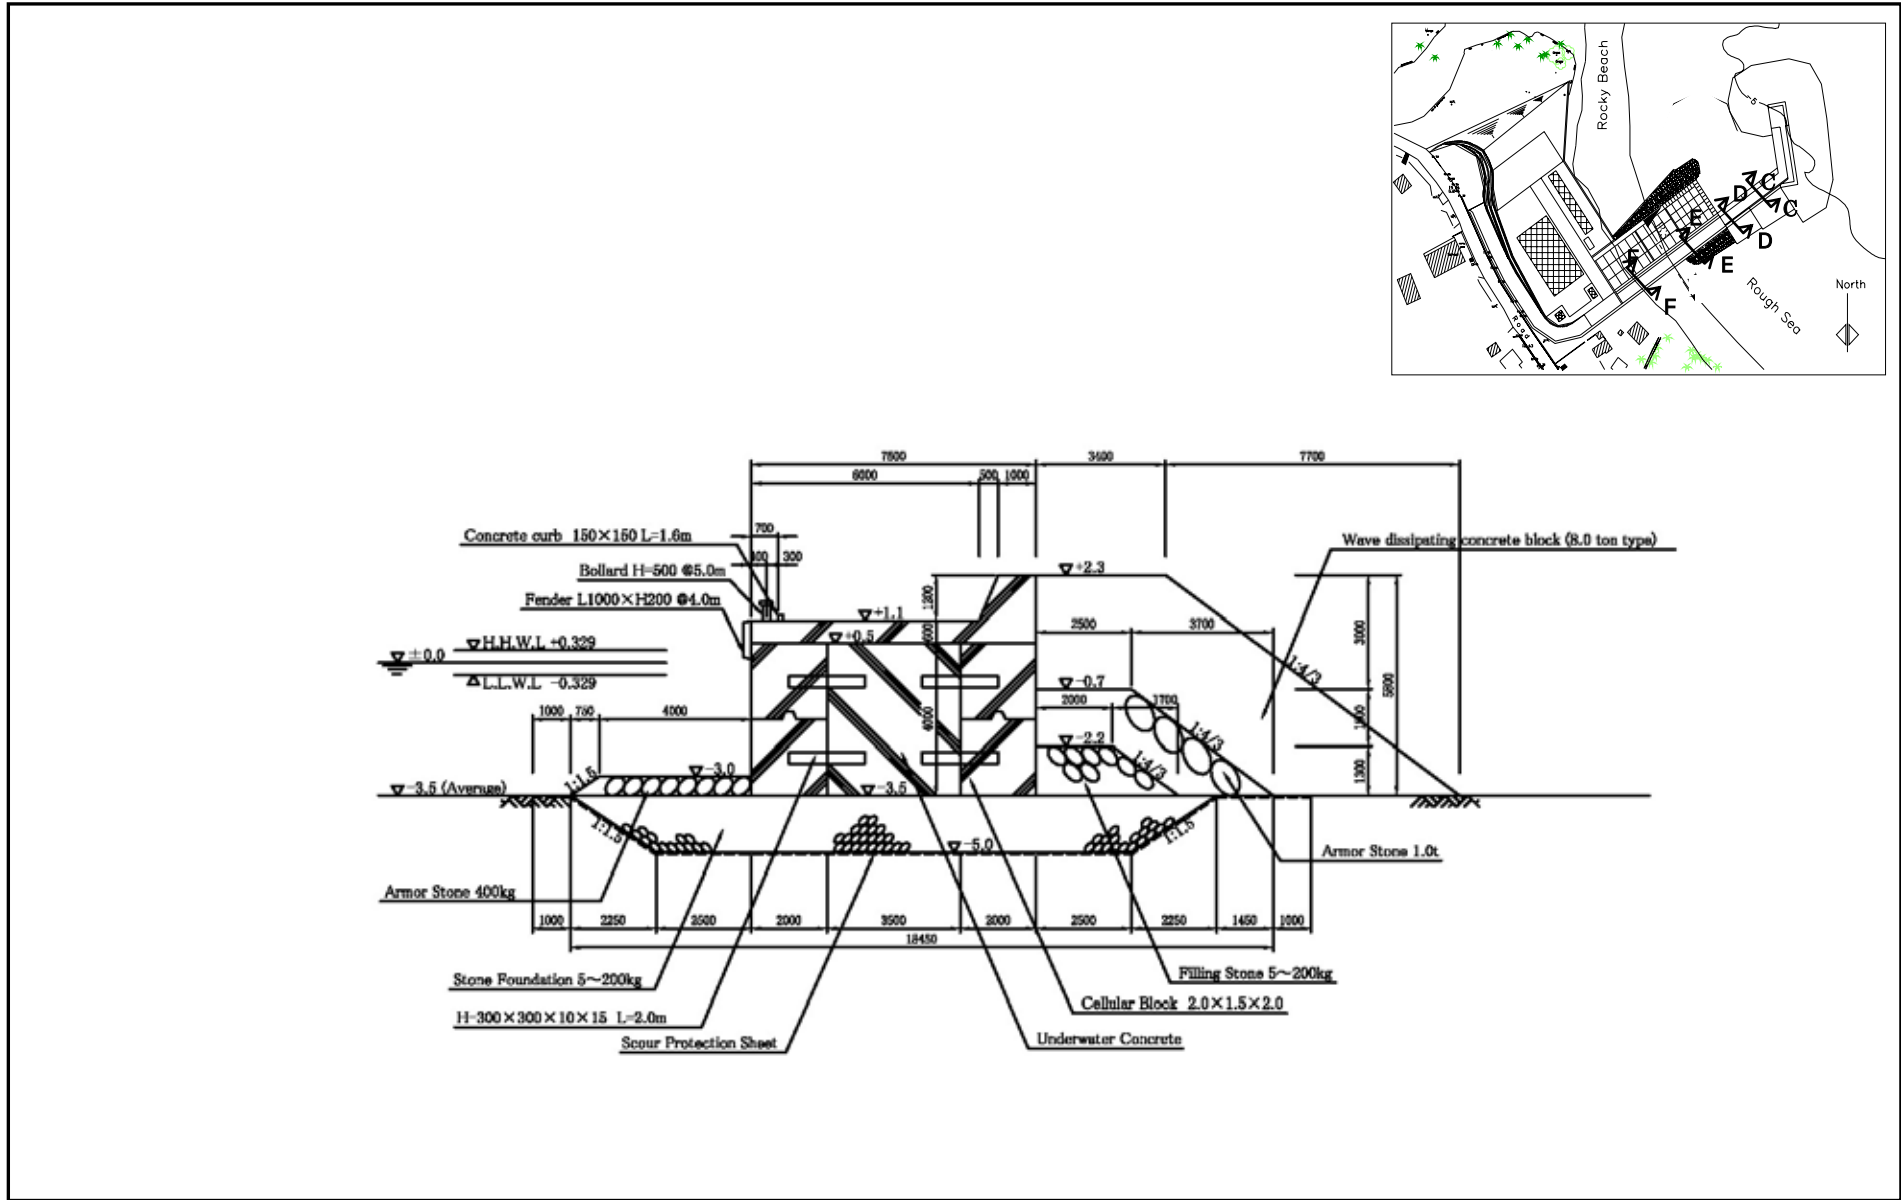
(4) Cross Section for Revetment (Section C-C)
